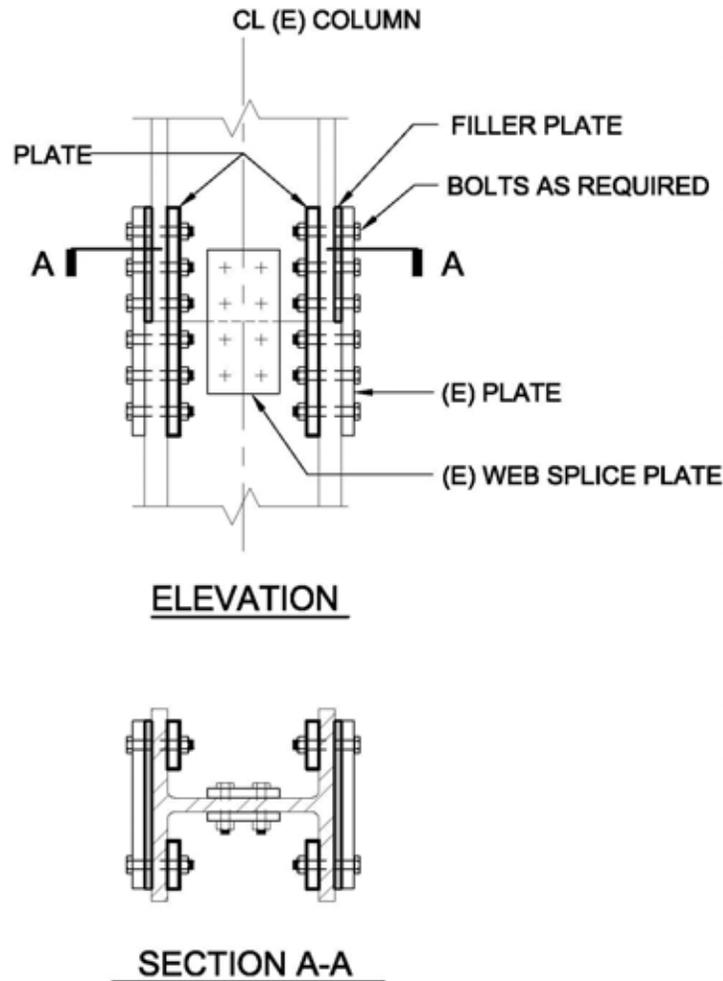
Bolted Splice Upgrade at Existing Column
